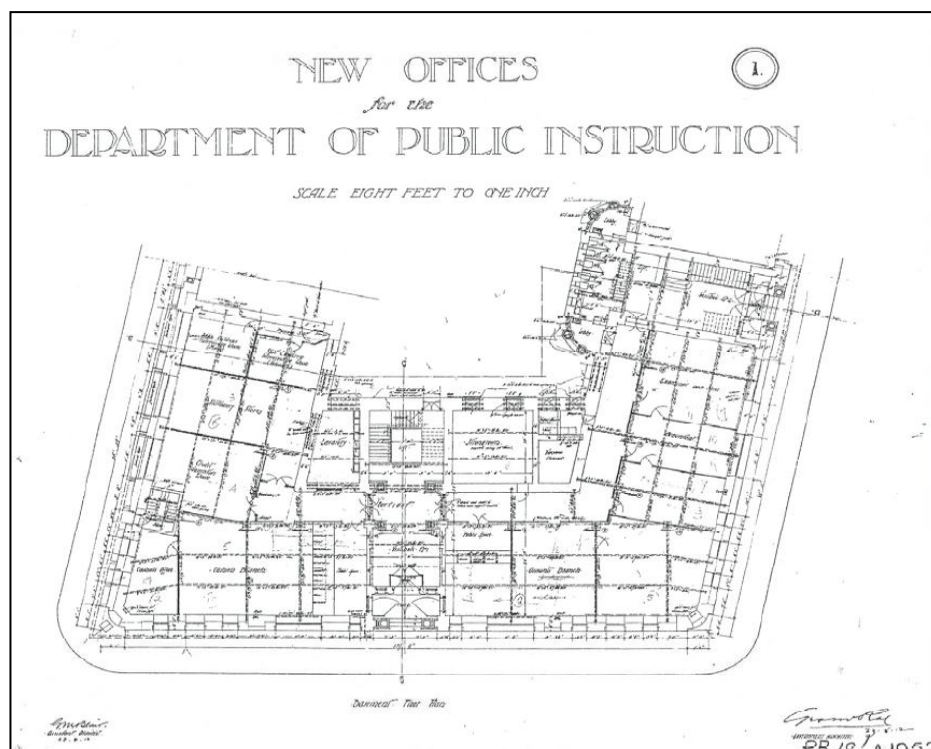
The basement (ground floor [Level 1]) plan of the new building, with the main public entrance on Bridge Street.
